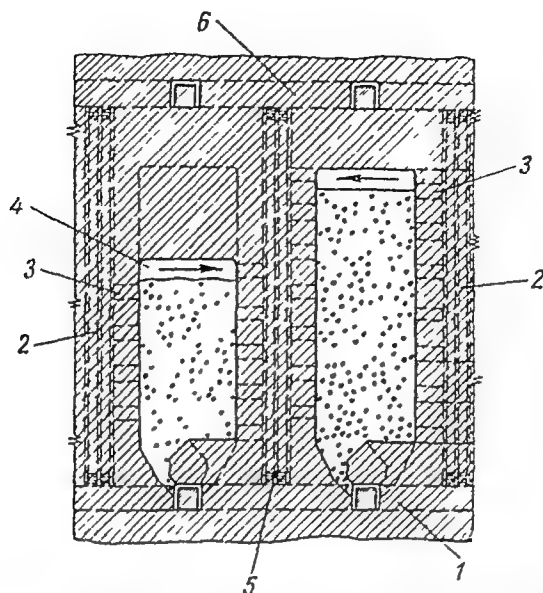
Ventilation layout for mining thick deposits by shrinkage stoping
